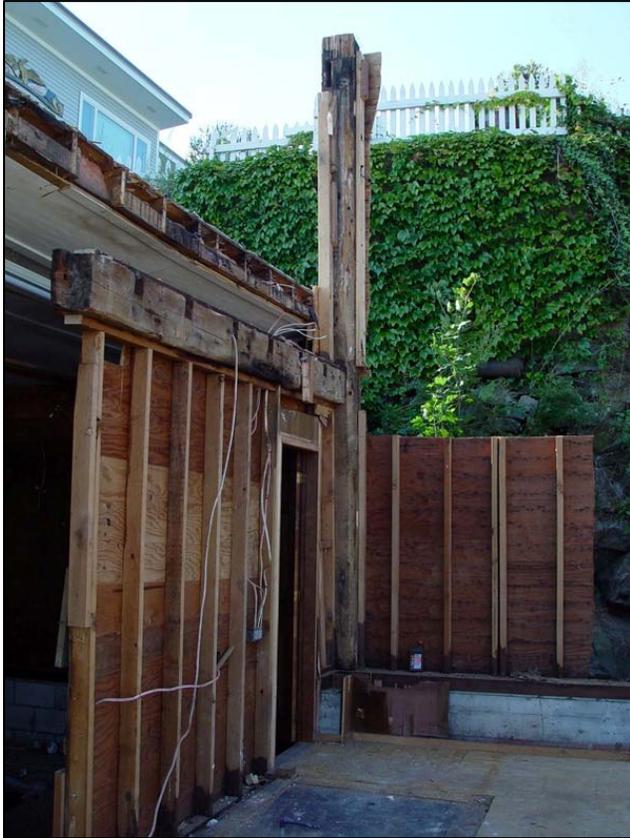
Disassembly of west end wall, with northwest corner post still standing.
